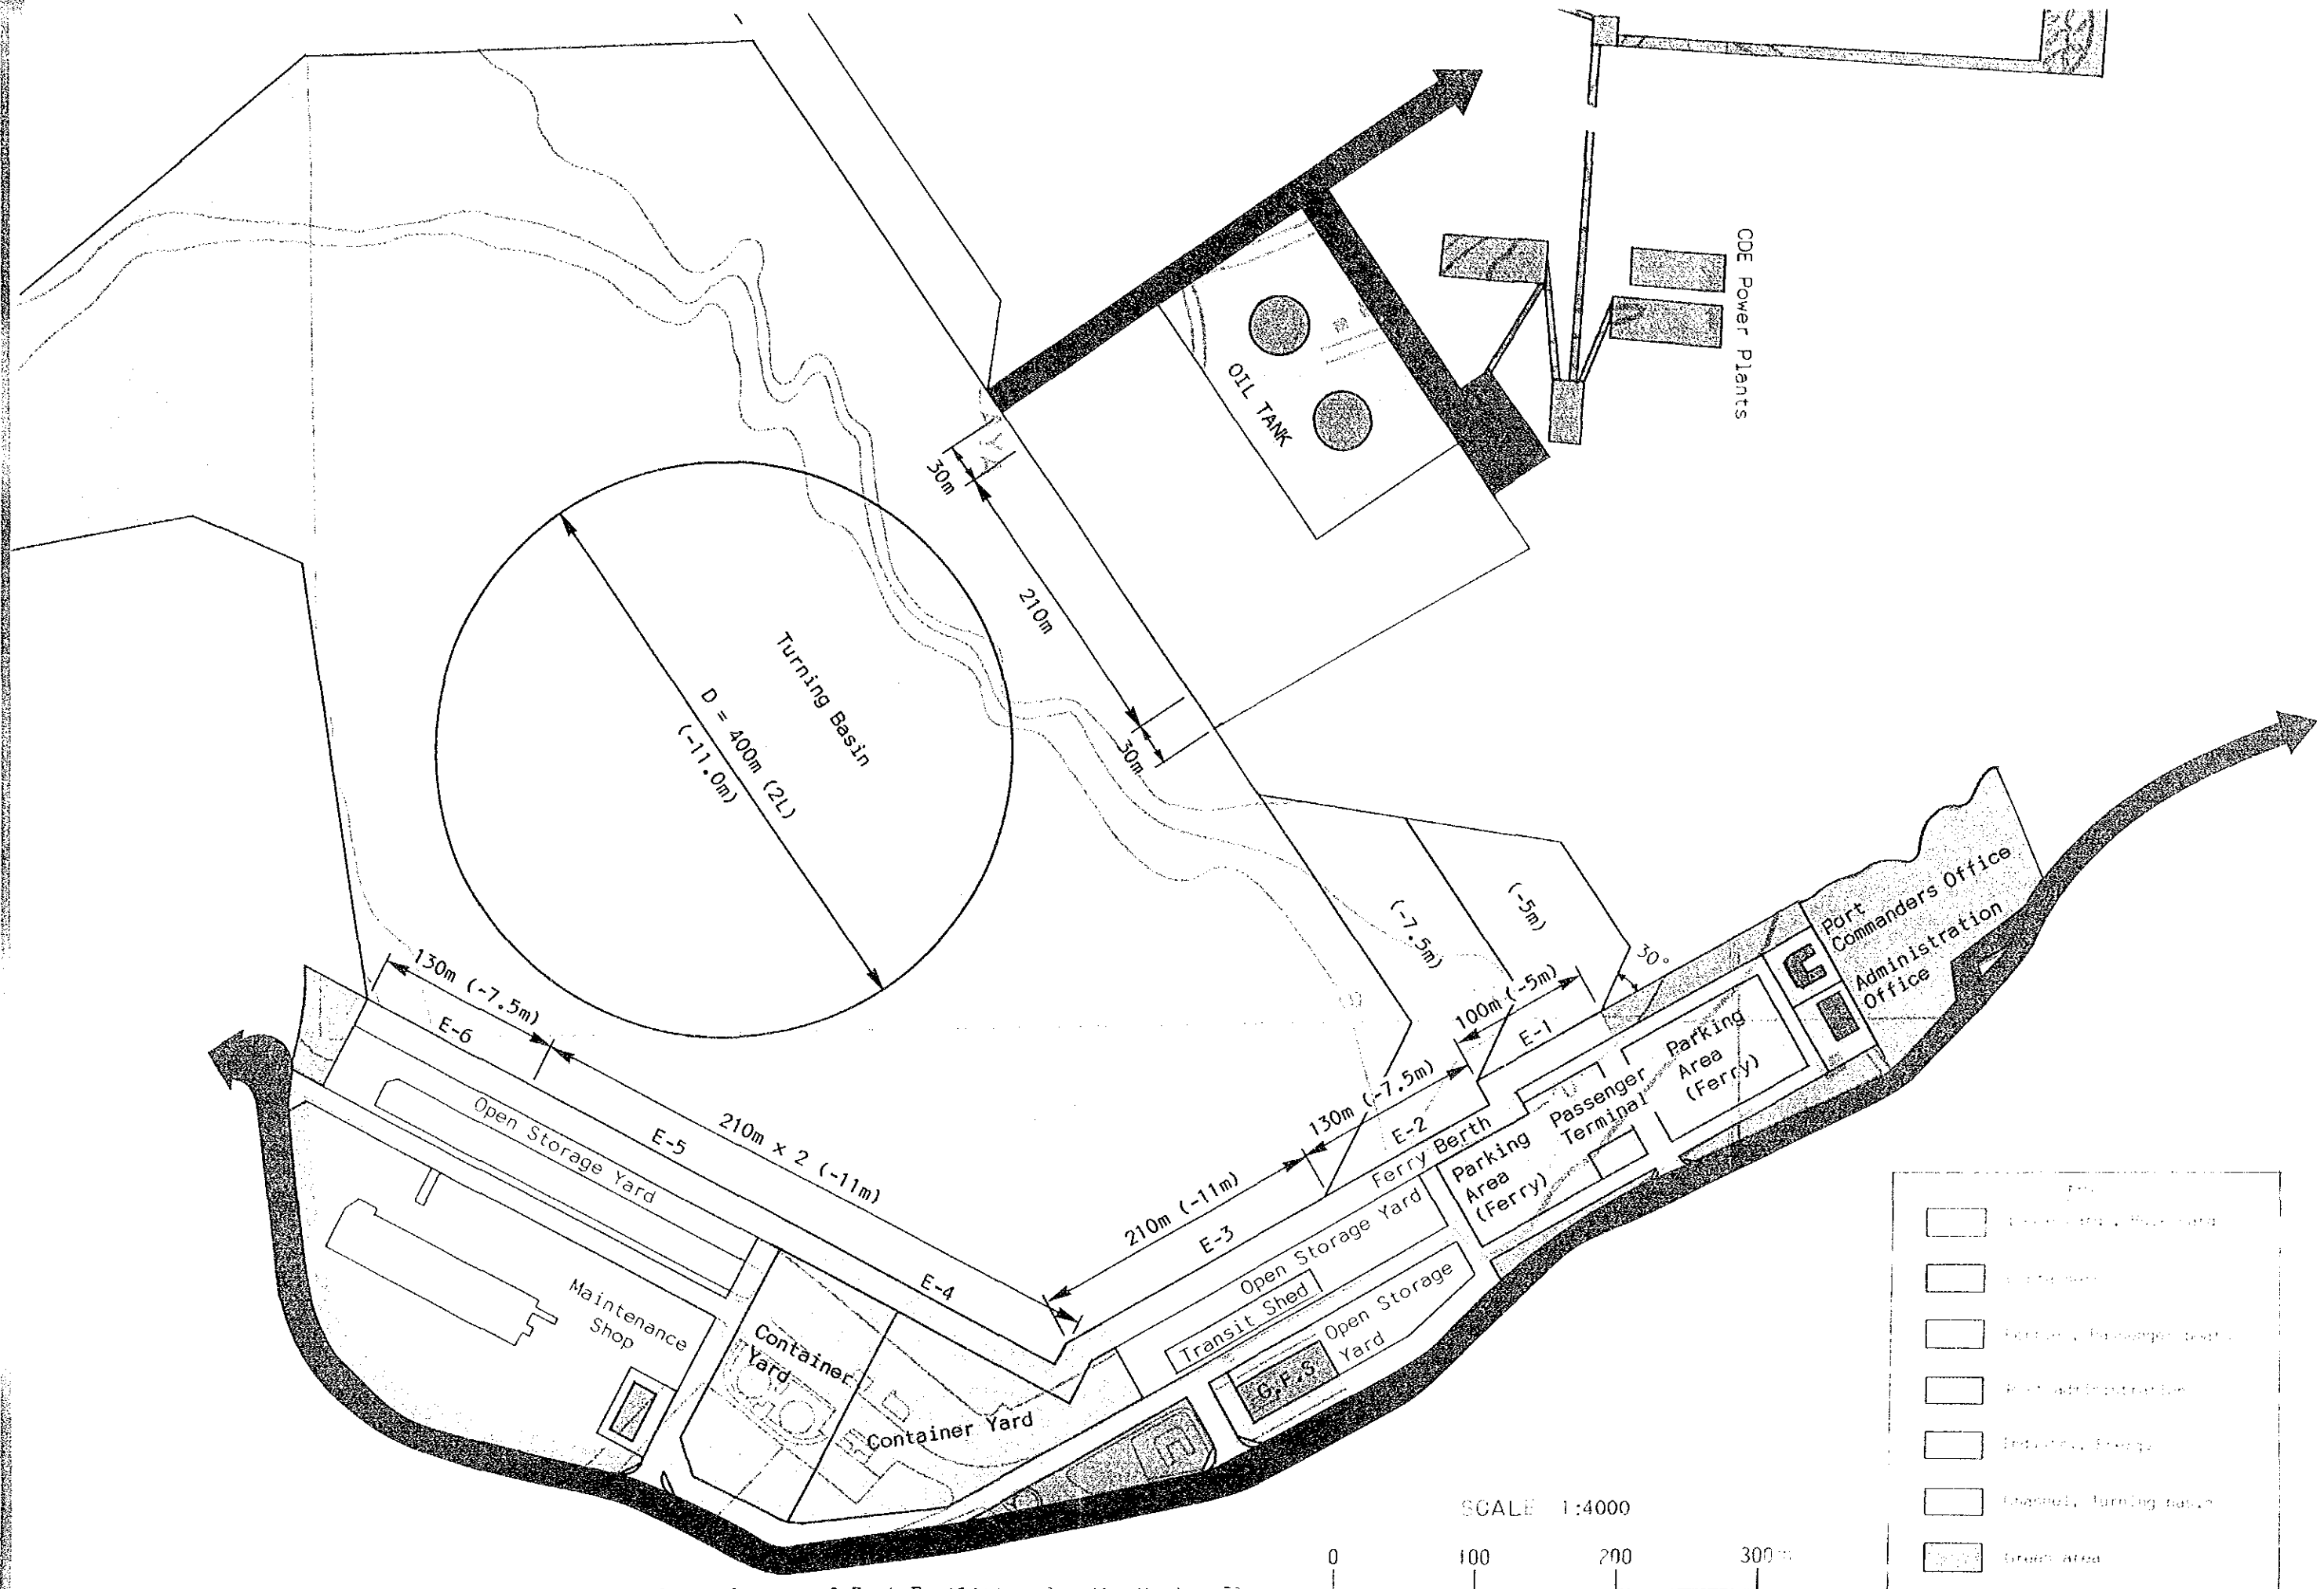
Layout of Port Facilities for the Master Plan
